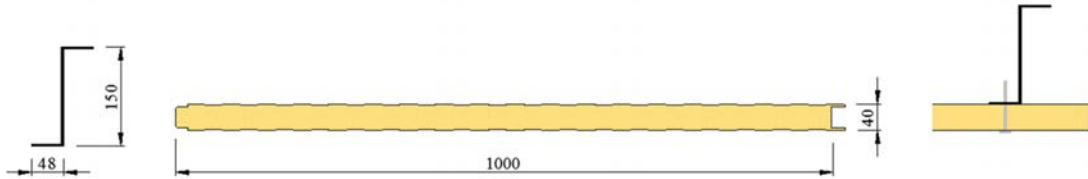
Cross-sections of the tested purlins and panels and fastening of the members.
